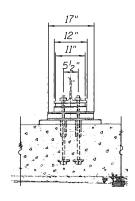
DETAIL OF BRACKET FOR EXPANSION DEVICE PIER C4 BETWEEN BEAMS 19 AND 20
